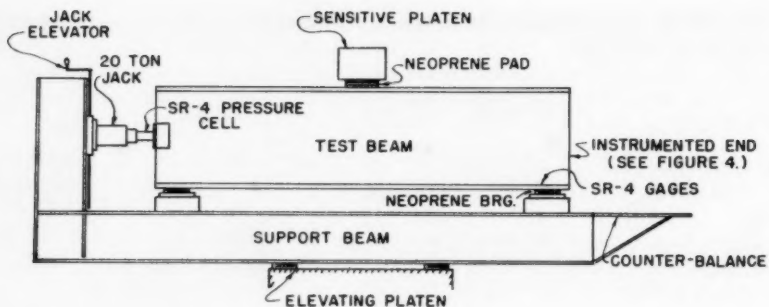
SCHEMATIC DIAGRAM OF A TEST BEAM AND THE LOADING FRAME IN THE UNIVERSAL TESTING MACHINE
